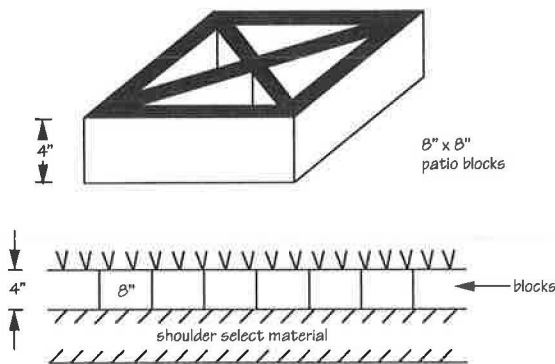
Parking support using open concrete blocks: *top*, system to allow turf to grow in swale and to bear load of parked vehicles using open concrete patio blocks; *bottom*, open concrete blocks filled with sandy soil.
